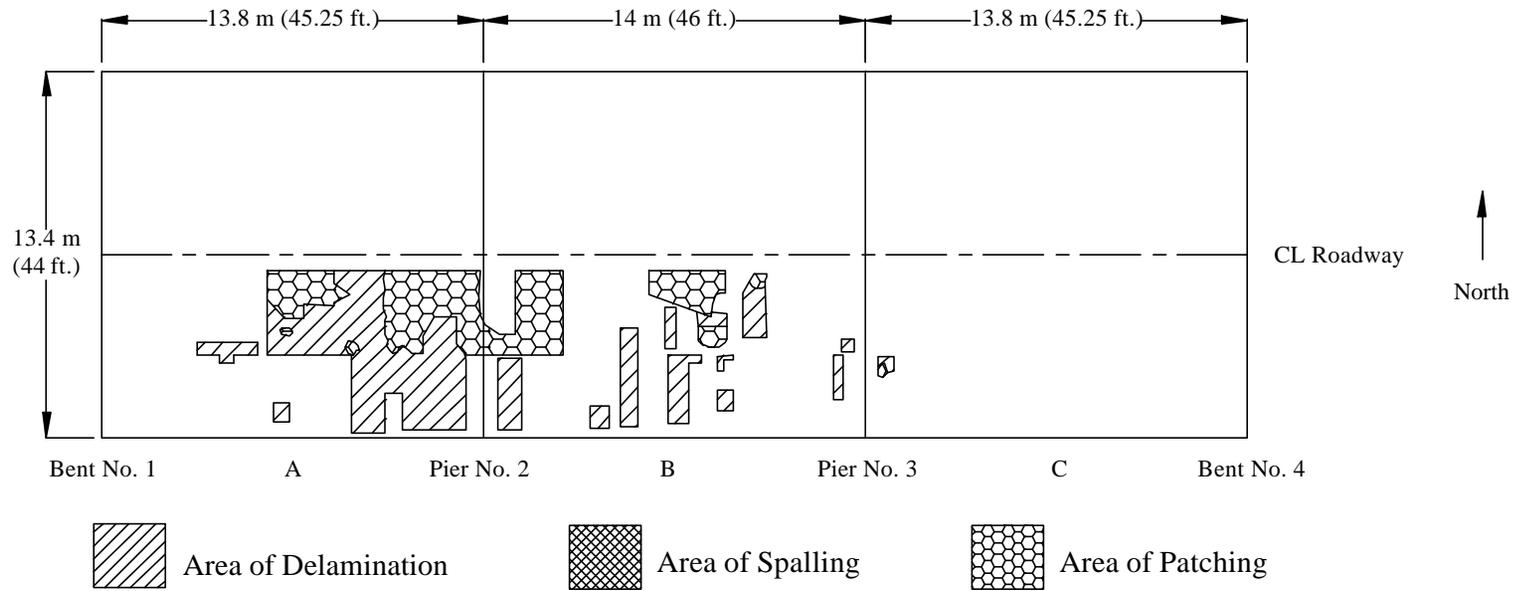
Delaminations, Spalls, and Patching Found on Structure #6-50-5187
